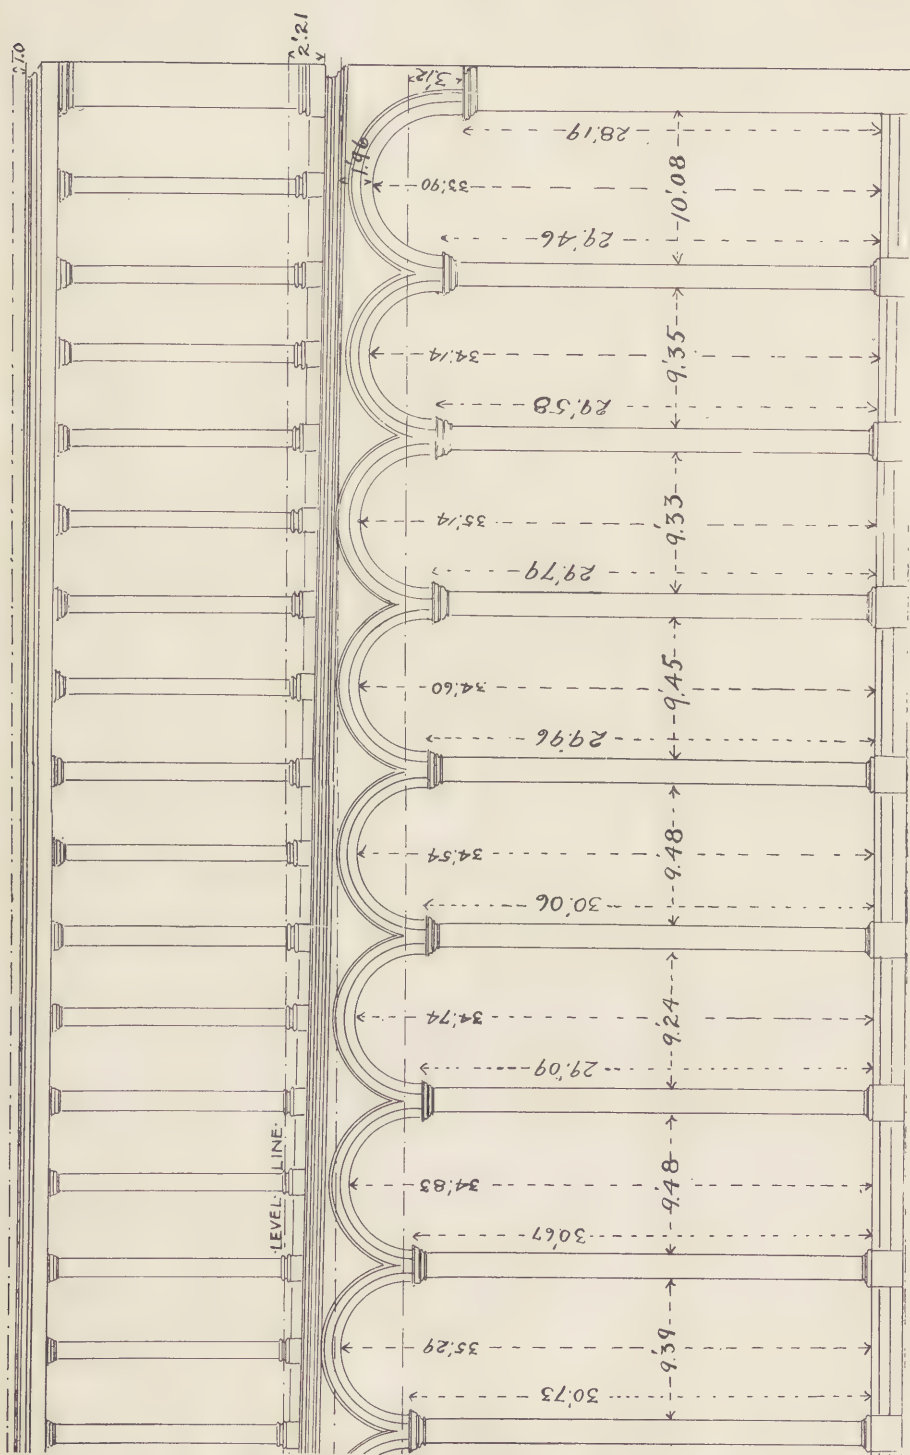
A.—SECTION OF THE SOUTH WALL, ADJOINING THE TRANSEPT PISA CATHEDRAL.
